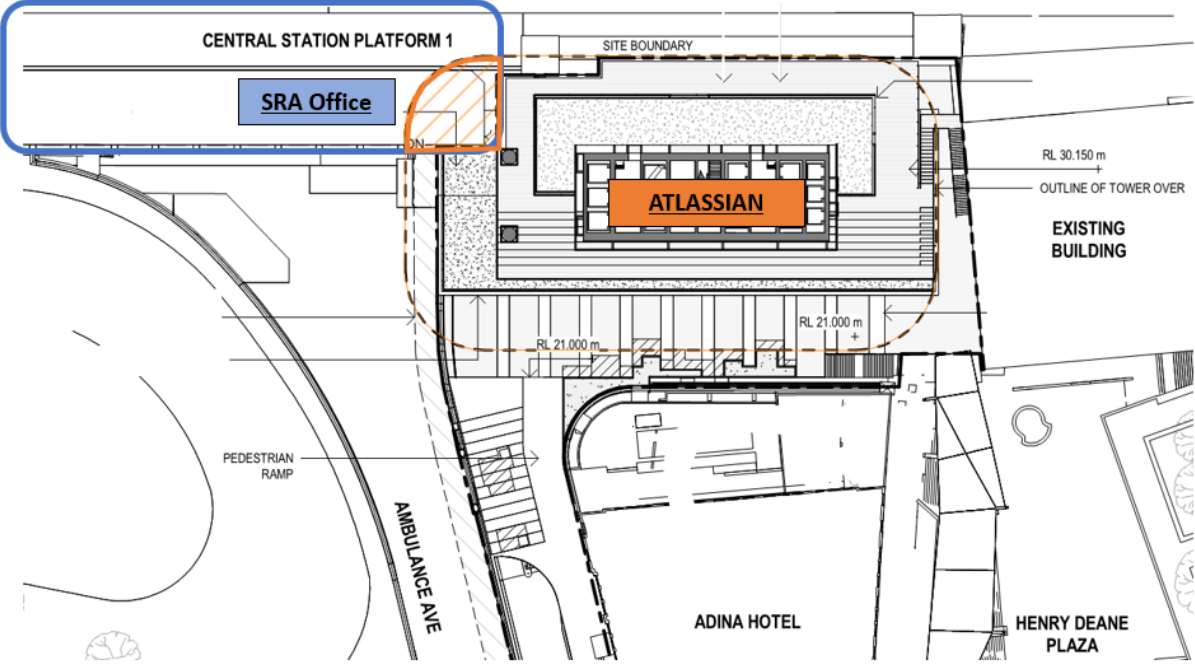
North-East Oversail Plan (SRA Office Below, Atlassian Level T1 Above)
